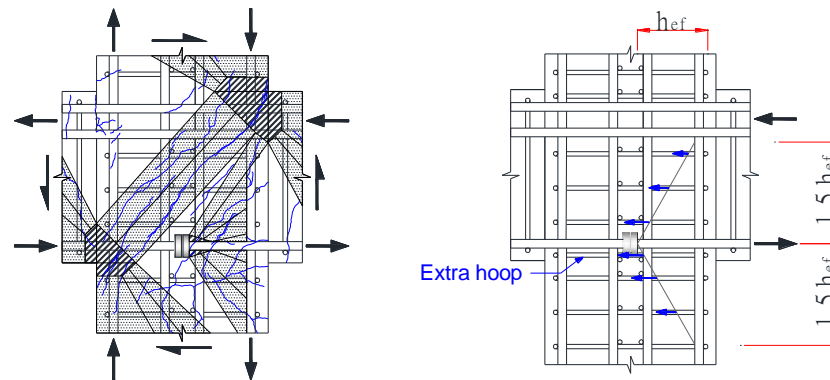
Strut-and-tie modelling for precluding the concrete breakout failure.
